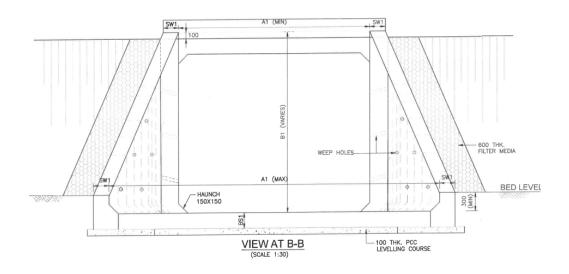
(B) - Front view providing details of Haunch, Wall and Slab
